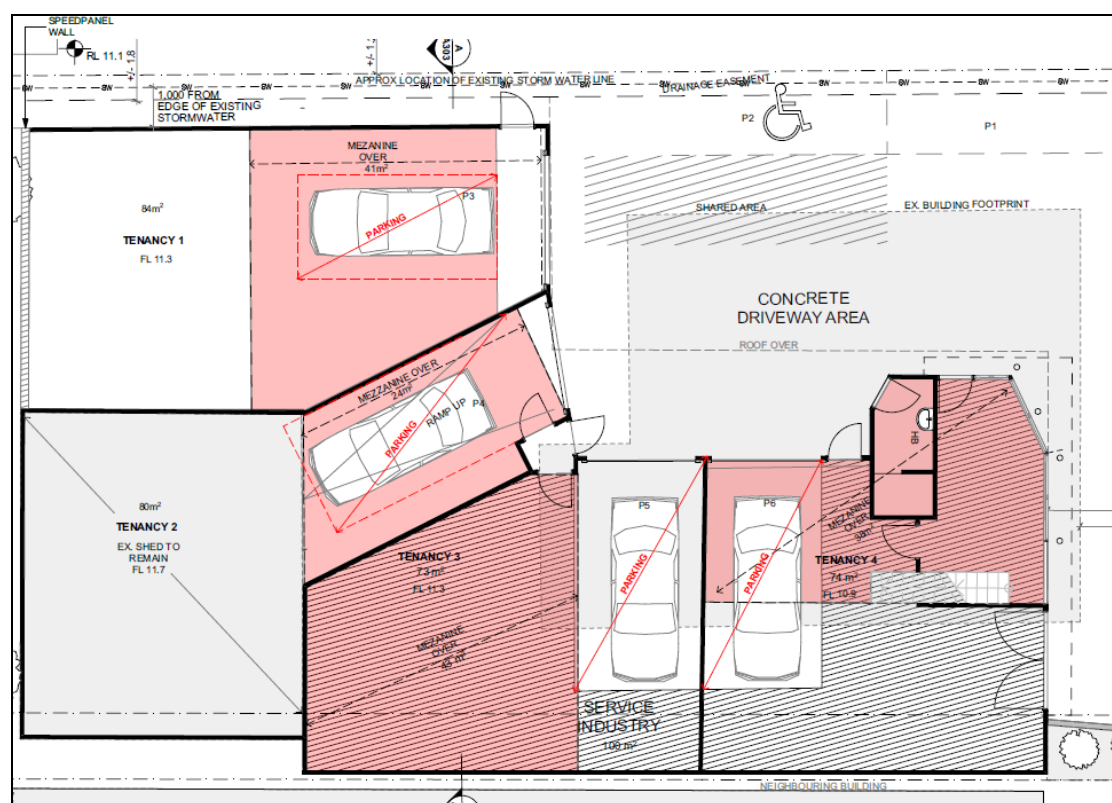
Snapshot of page 5 from P3 plans of proposed development – planning application PLN-17-314
